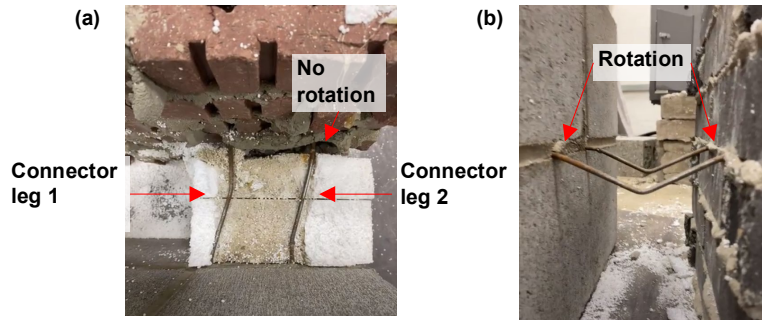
Rectangular-tie illustrations of (a) typical buckling for clay brick specimens with a horizontal deflection, (b) typical buckling for concrete veneer specimens with a vertical deflection
